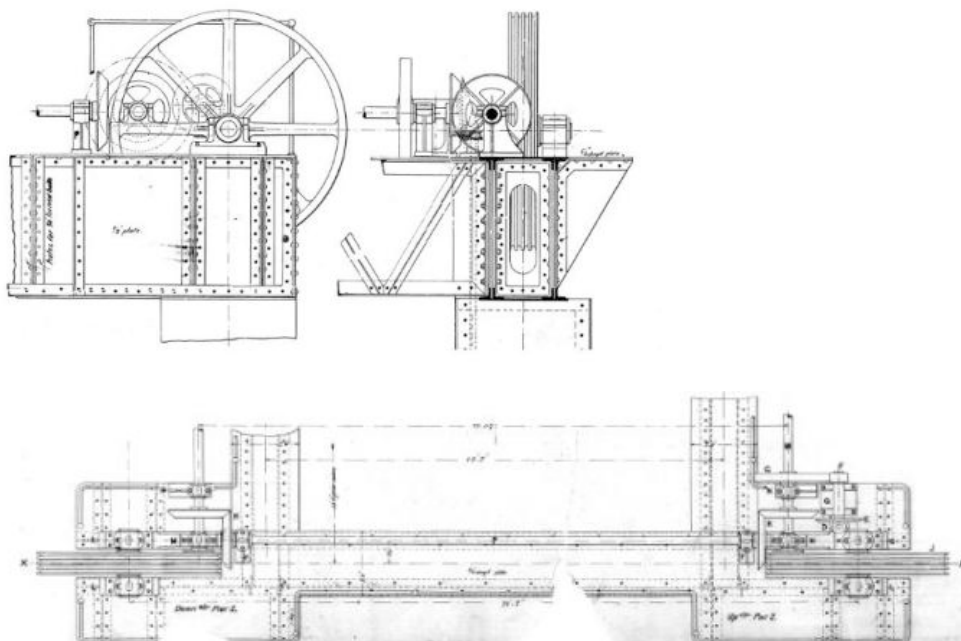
Plans of Swan Hill Bridge top sheaves, pinions and shafts
